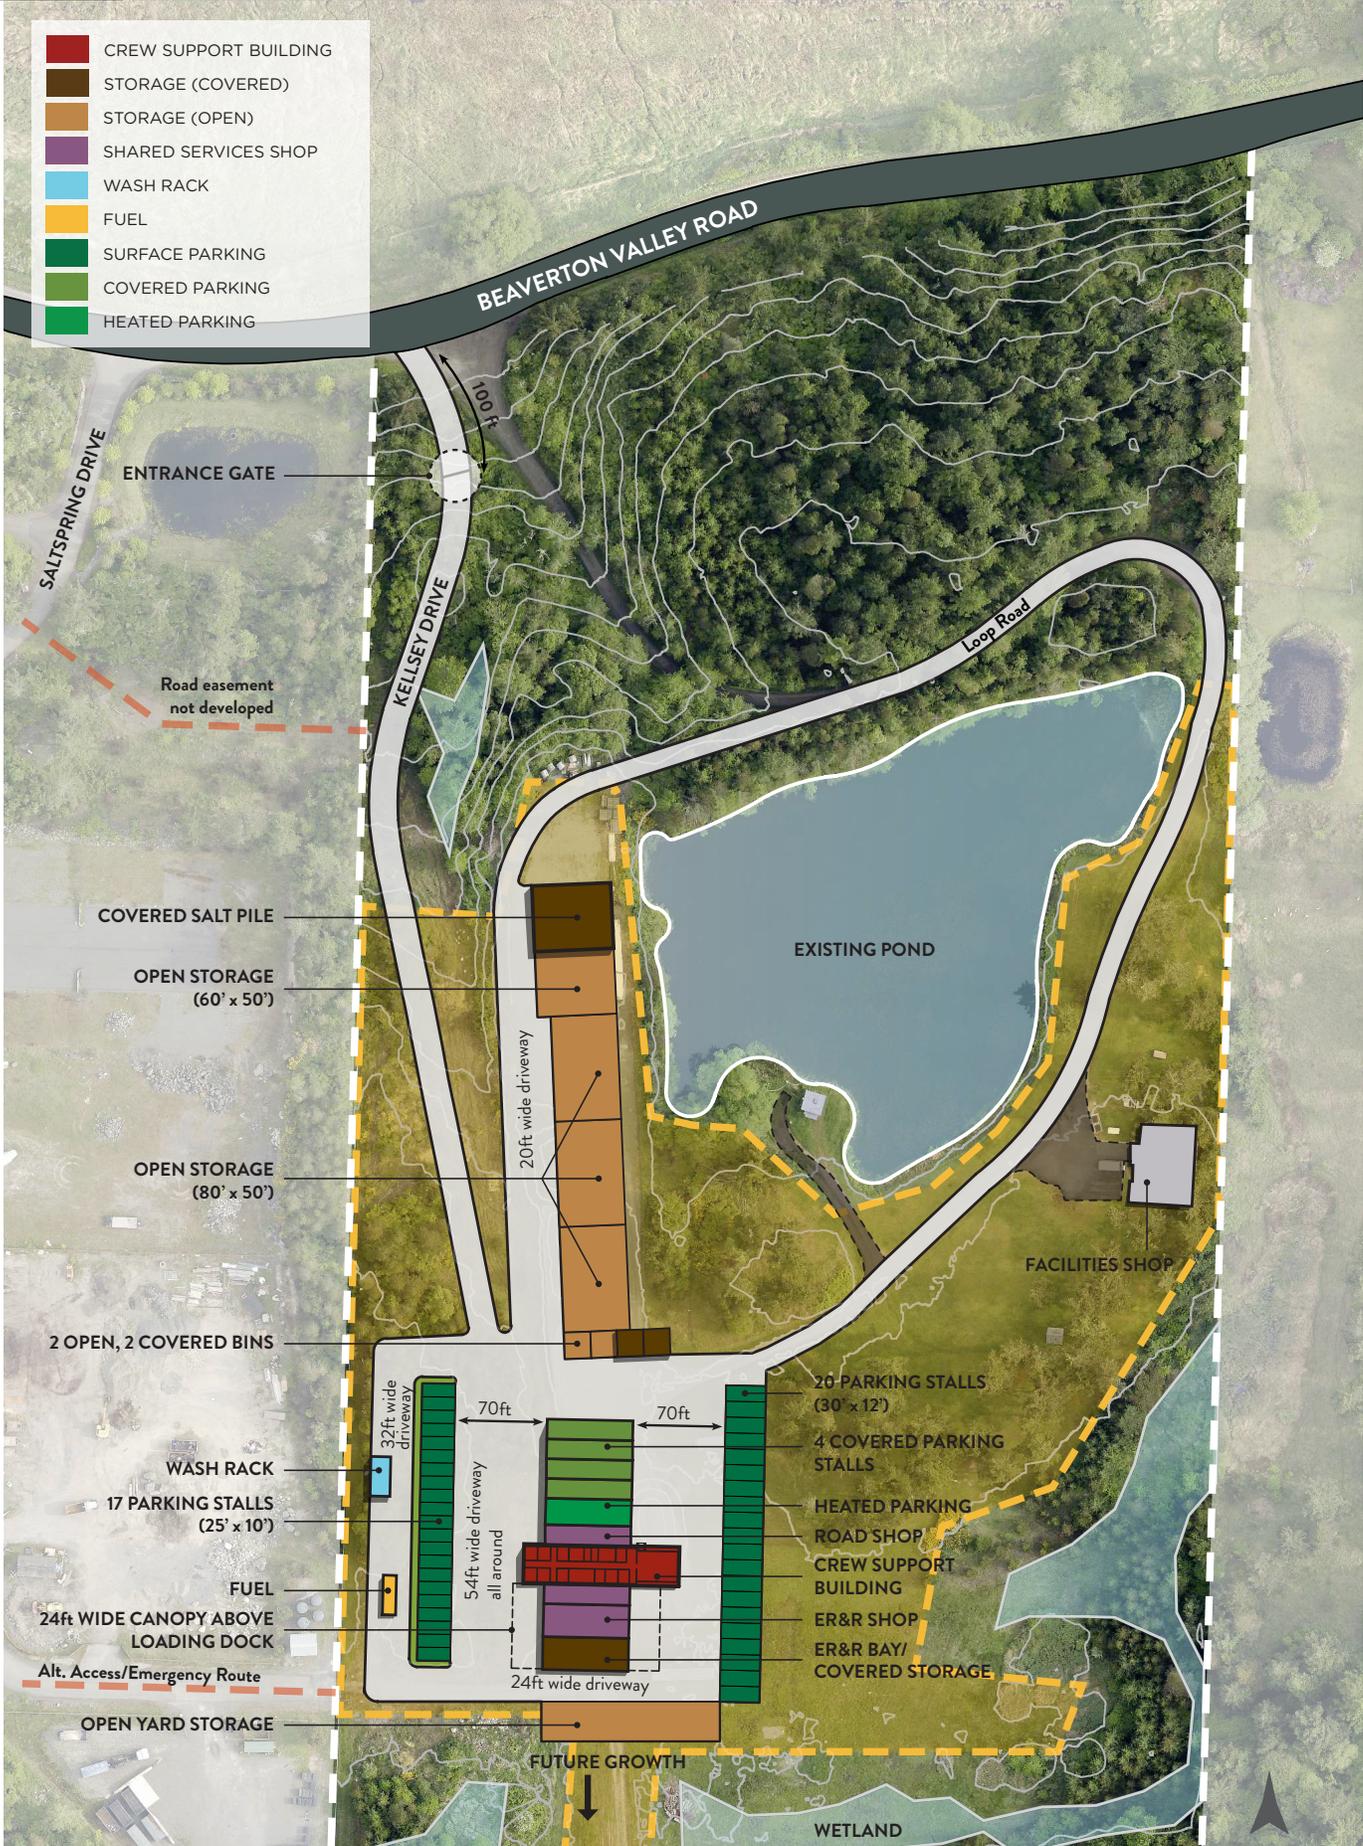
BEAVERTON VALLEY MASTER PLAN
